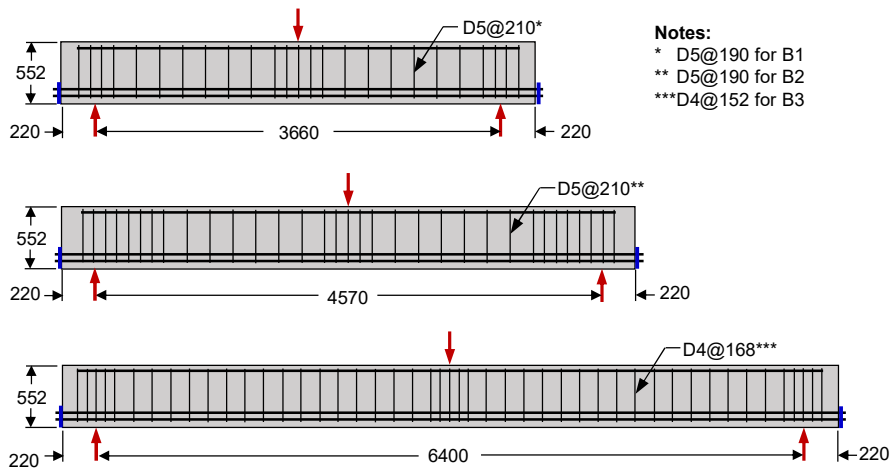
Geometric and reinforcement details of VS beams (adapted from [24]).
